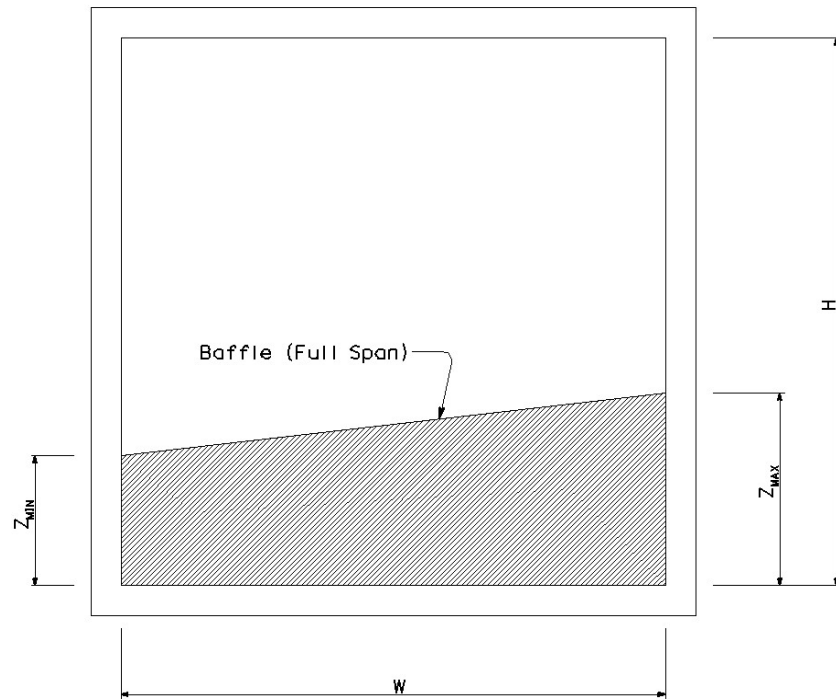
Top-Angled Baffle Cross Section For Box Culverts
